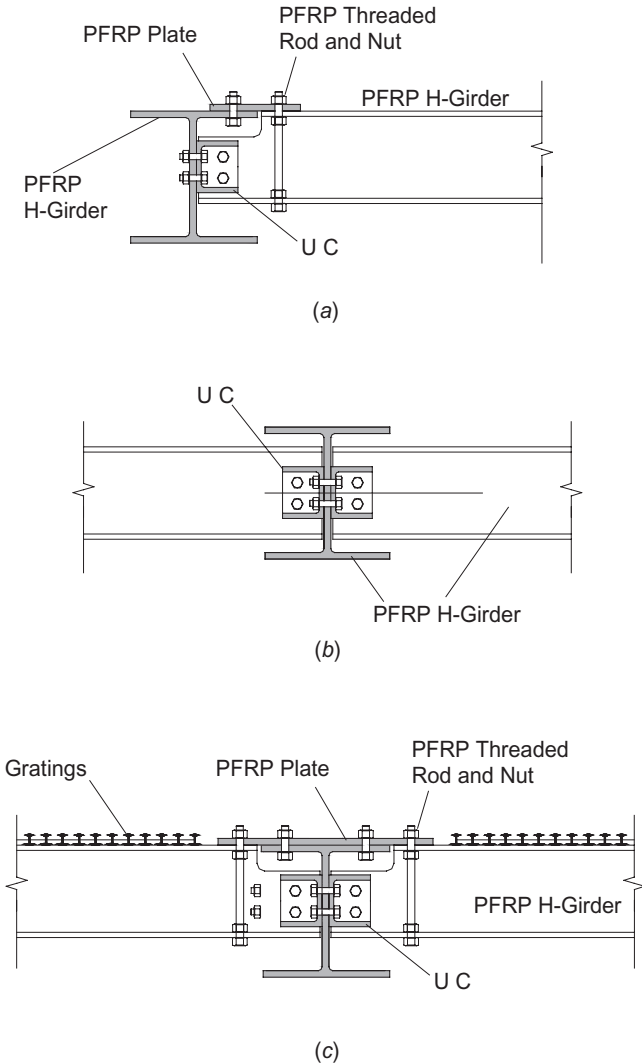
Hinged PFRP beam-to-girder connection details for open-web profiles (both interior and exterior).
